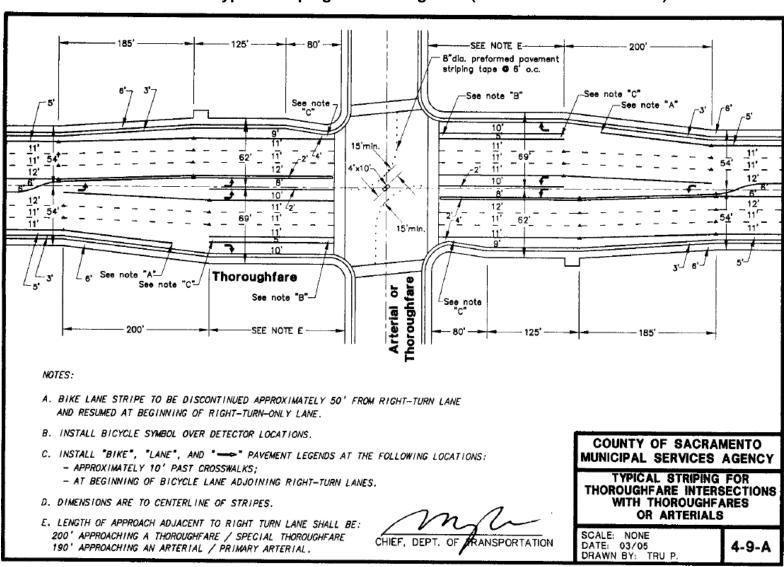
Typical Striping for Thoroughfare (includes 5-foot bike lane)
